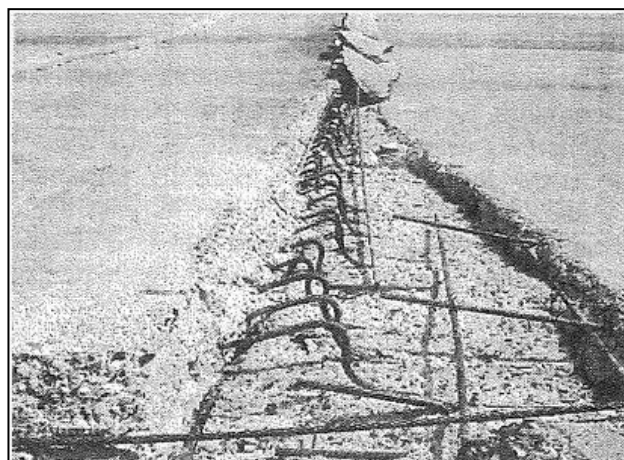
Concrete Facing Failed in Compression along a Vertical Joint
